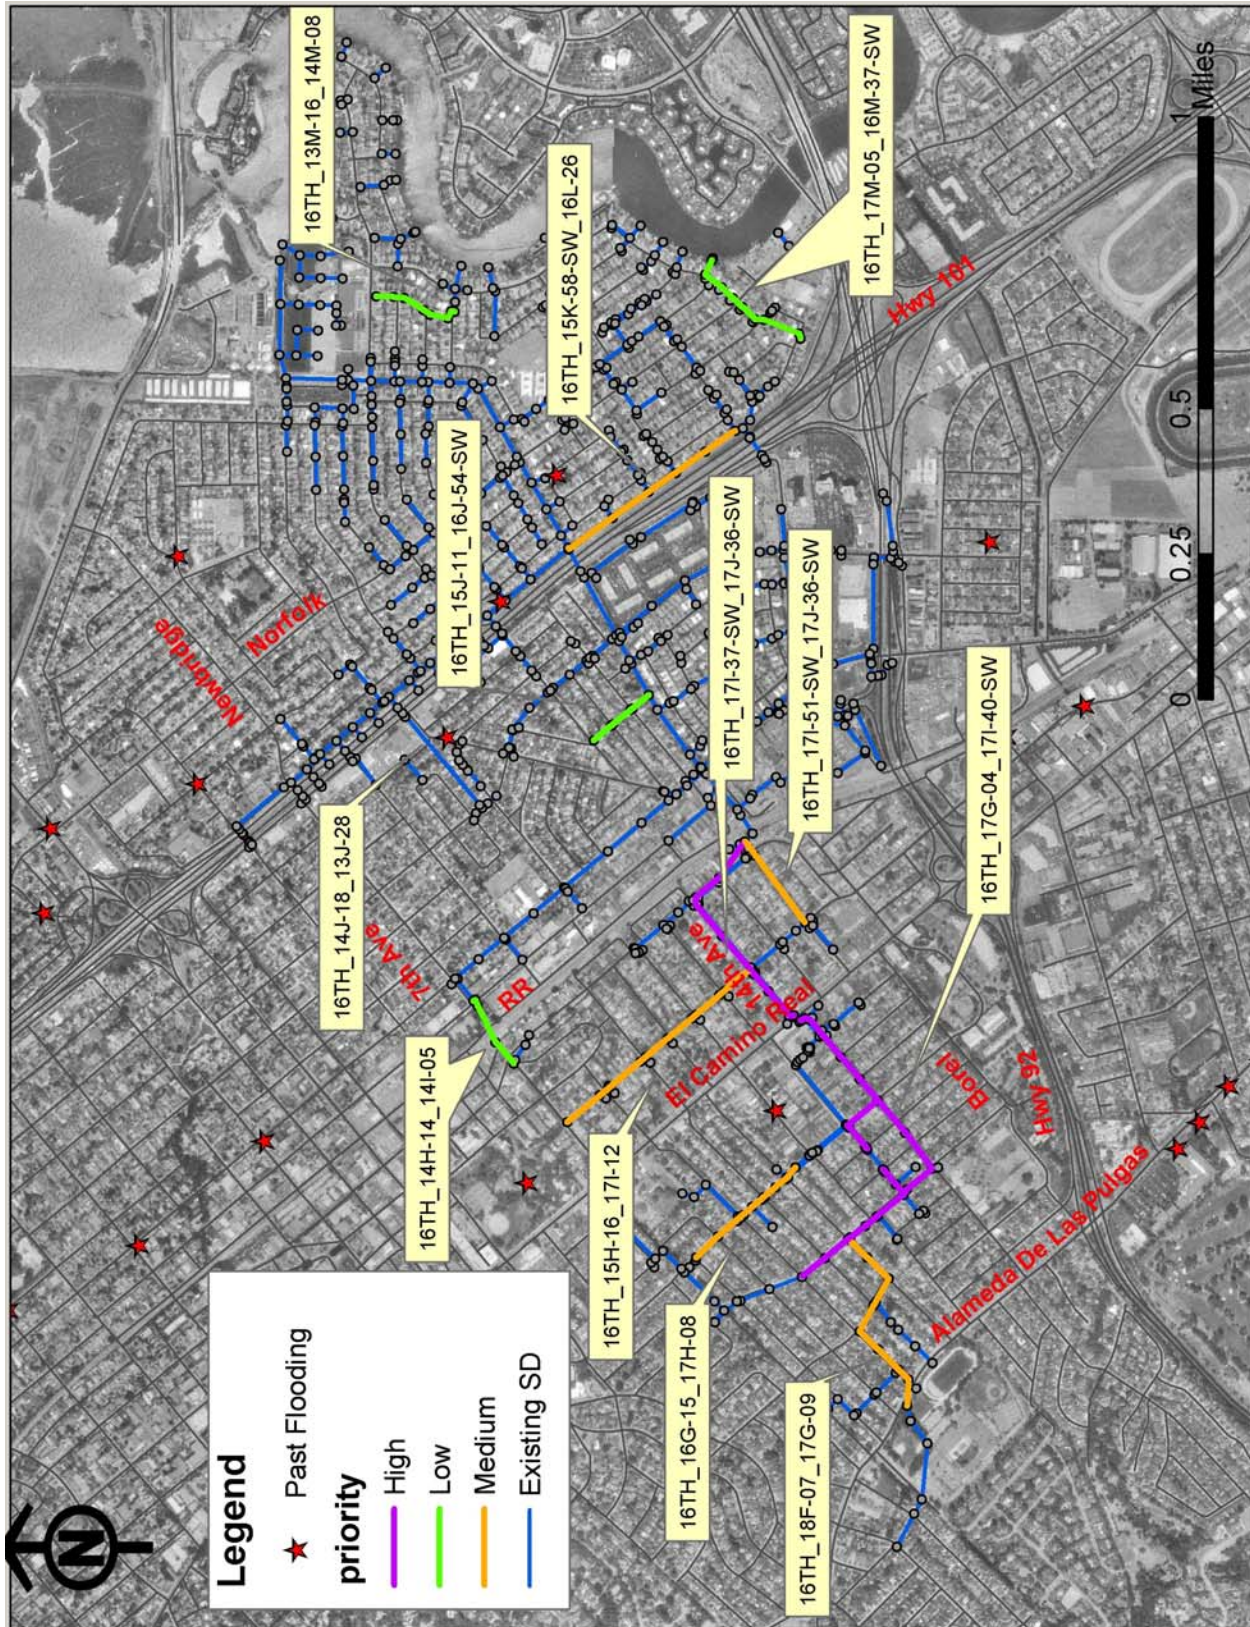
Master Plan for 16<sup>th</sup> Avenue Drain Area
